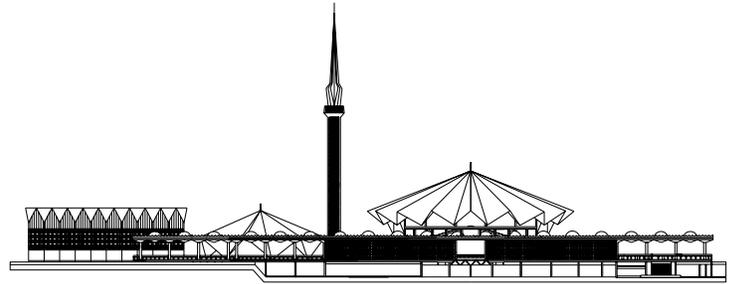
Simple division of elements on façade : base: wall: roof (Ismail 2007)
